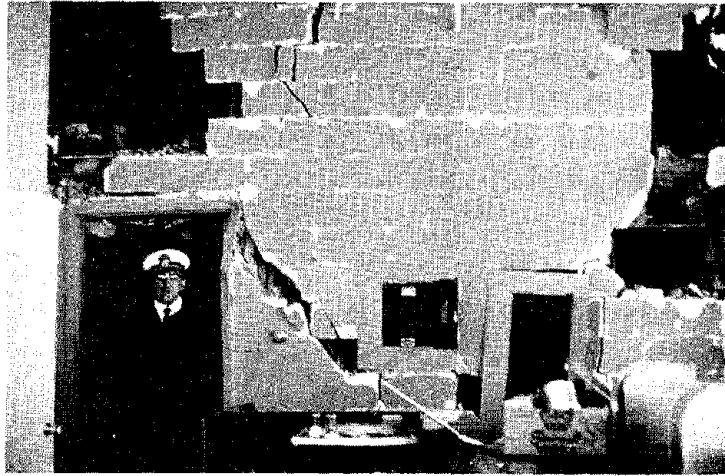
Unreinforced Masonry Interior Wall Failure
